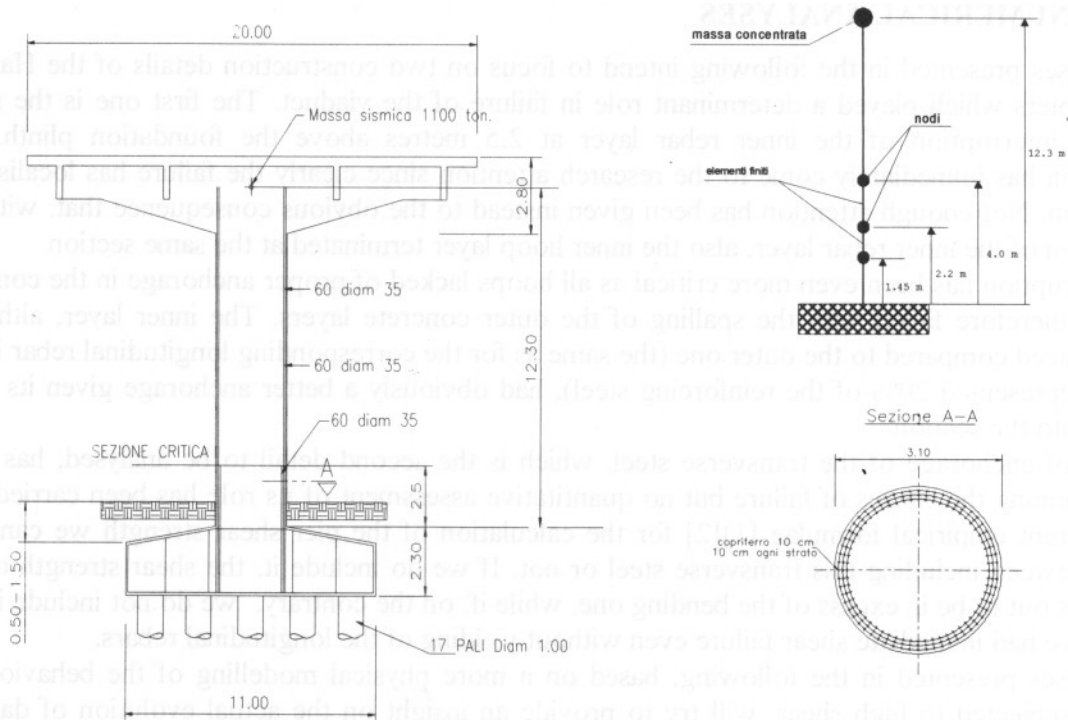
Hanshin's pier geometry and F.E. schematisation
